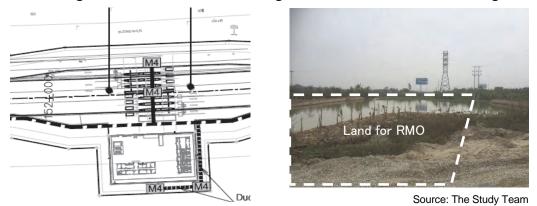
Location of Road Management Office in Ha Noi – Bac Giang Section
